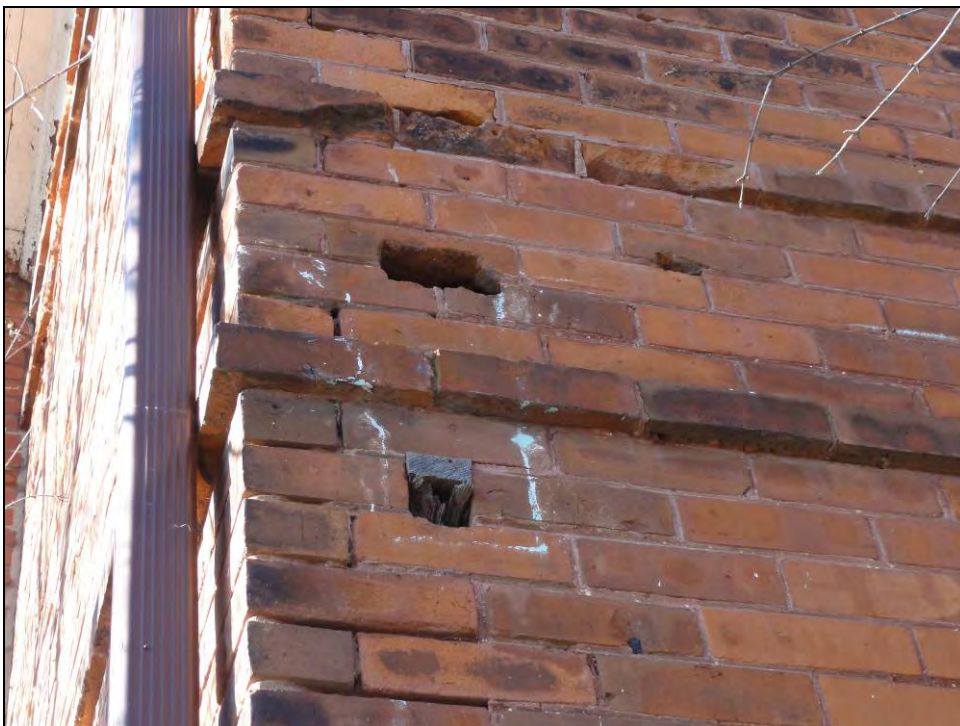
South corner of front elevation, showing remnants of wooden frame porch in exterior brickwork.
